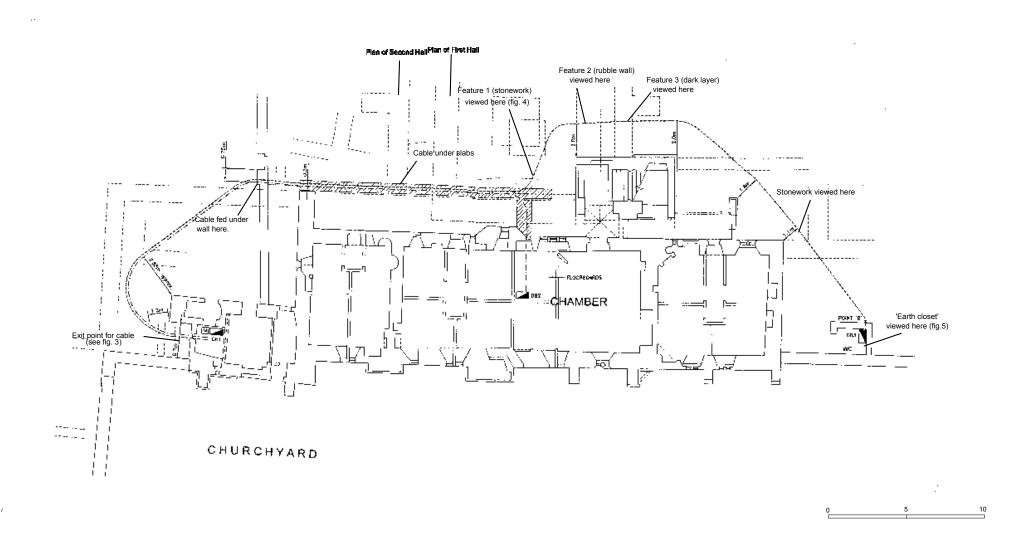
Plan of Bedehouse with cable trench, with archaeological features highlighted.
